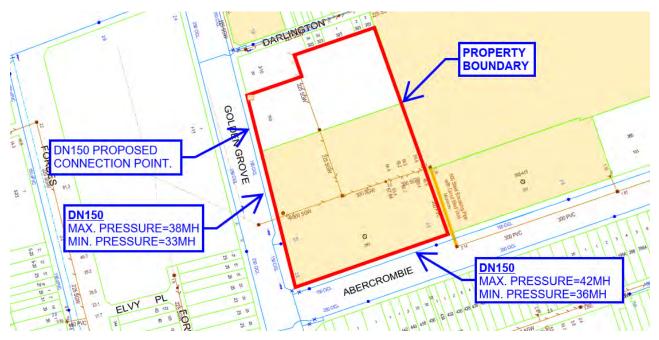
Proposed Connection Point to Sydney Water Utility (Water) Main
